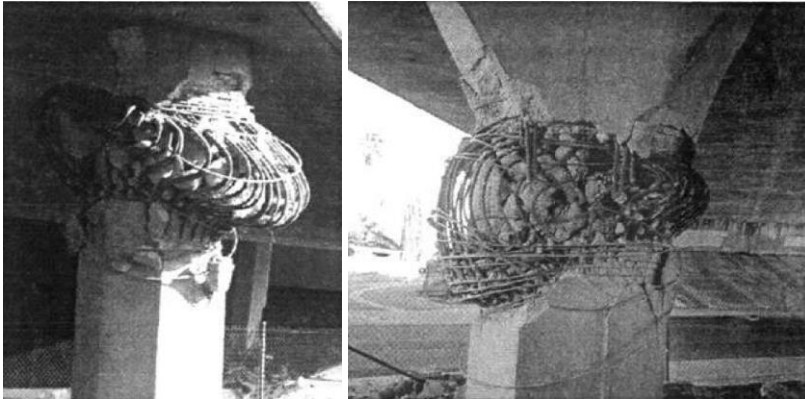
Confinement failure on the top of pier, Mission Gothic Overpass Bridge, Northridge Earthquake, USA, 1994
